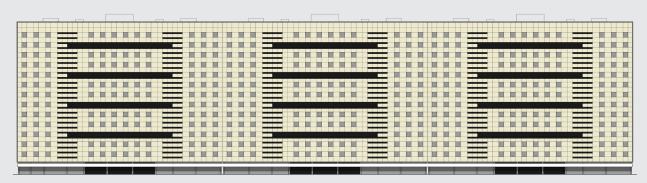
Original Facade of 'C' type Buildings. 1965.
